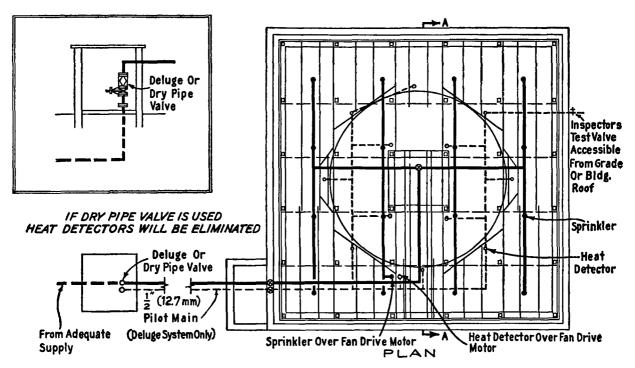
Typical deluge or dry pipe fire protection arrangement for counterflow towers.
